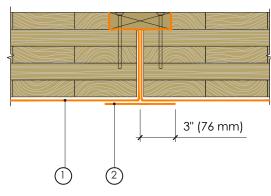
Erection of CLT wall panels on-site with pre-applied membrane.
